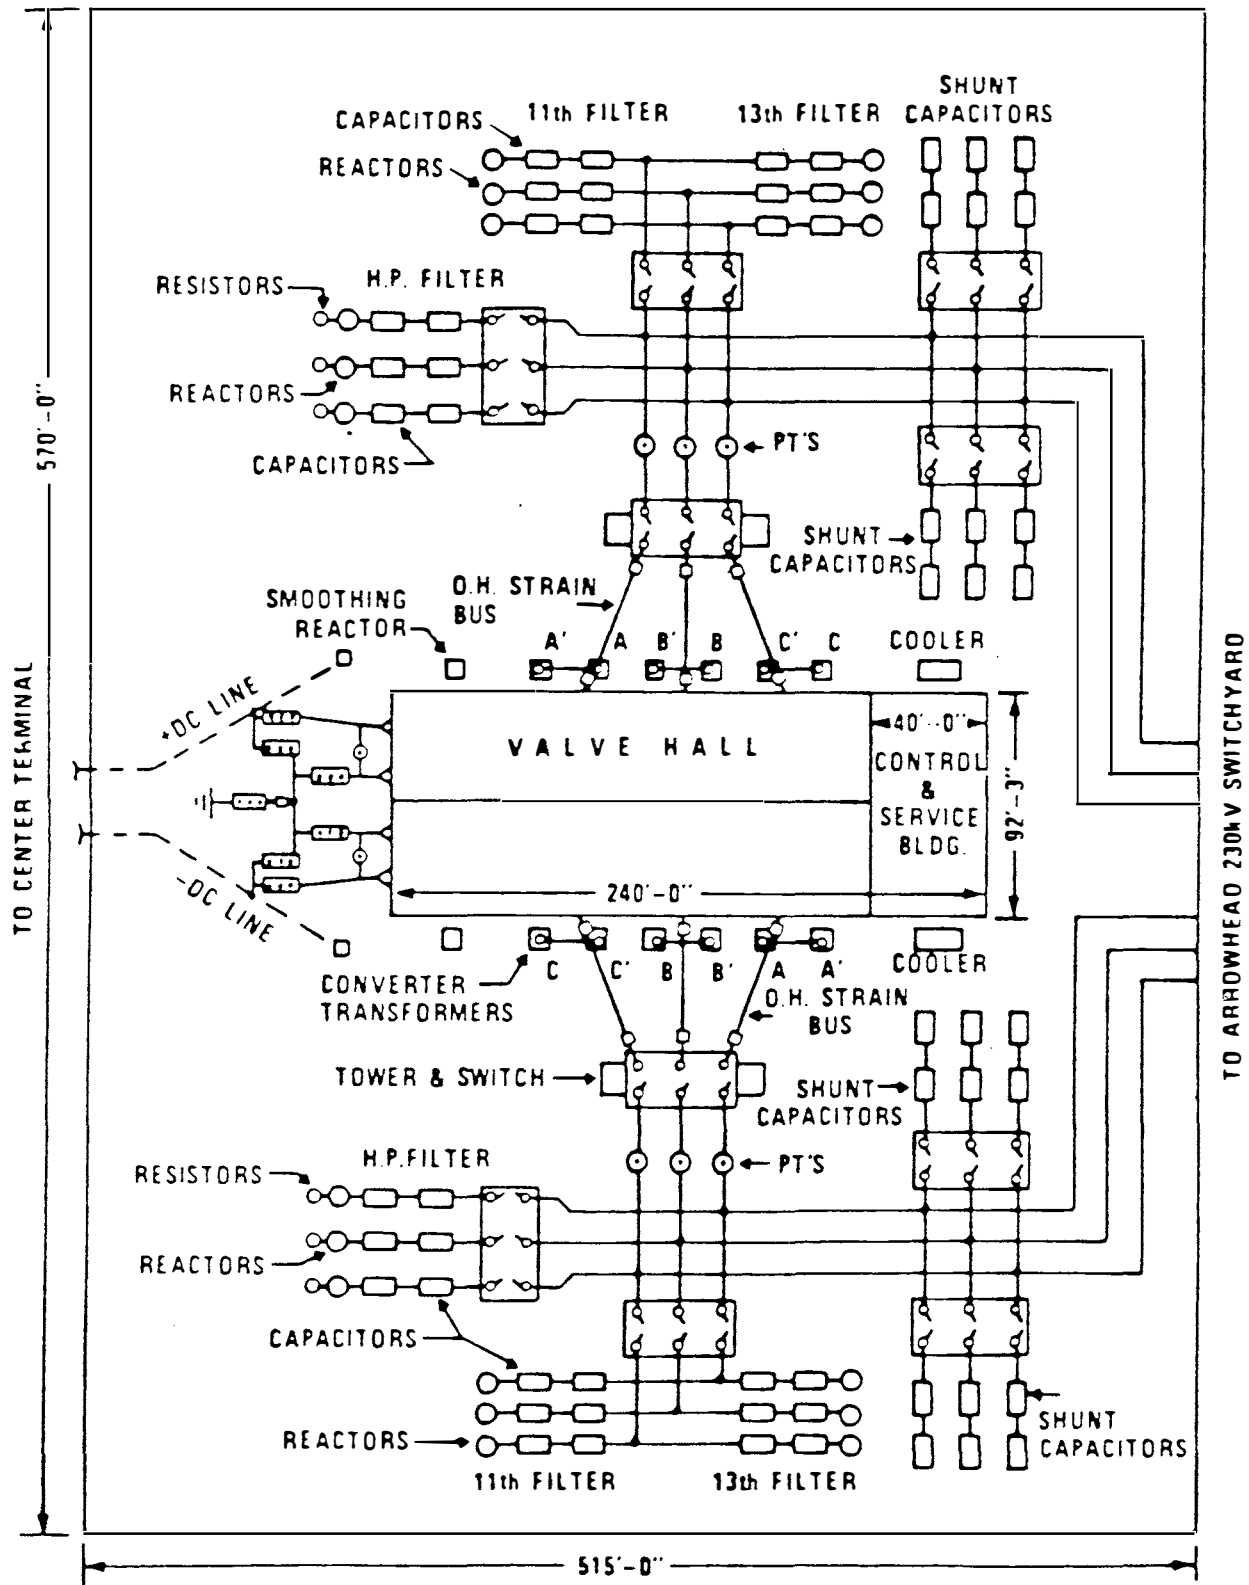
Arrowhead DC Terminal Yard Layout.
